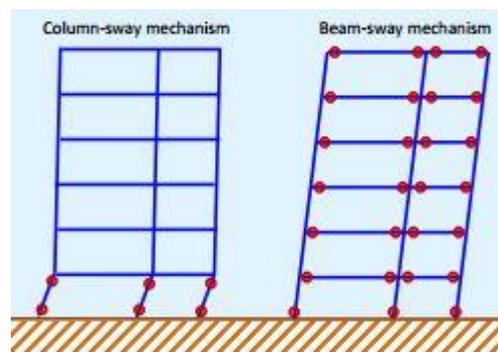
Possible collapse mechanisms for a frame: (left) column-sway collapse mechanism; (right) beam-sway collapse mechanism.
